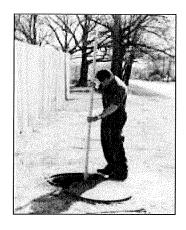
Measuring sediment in swirl chamber using stadia rod. Inspections are performed from the surface through the manhole access cover.
